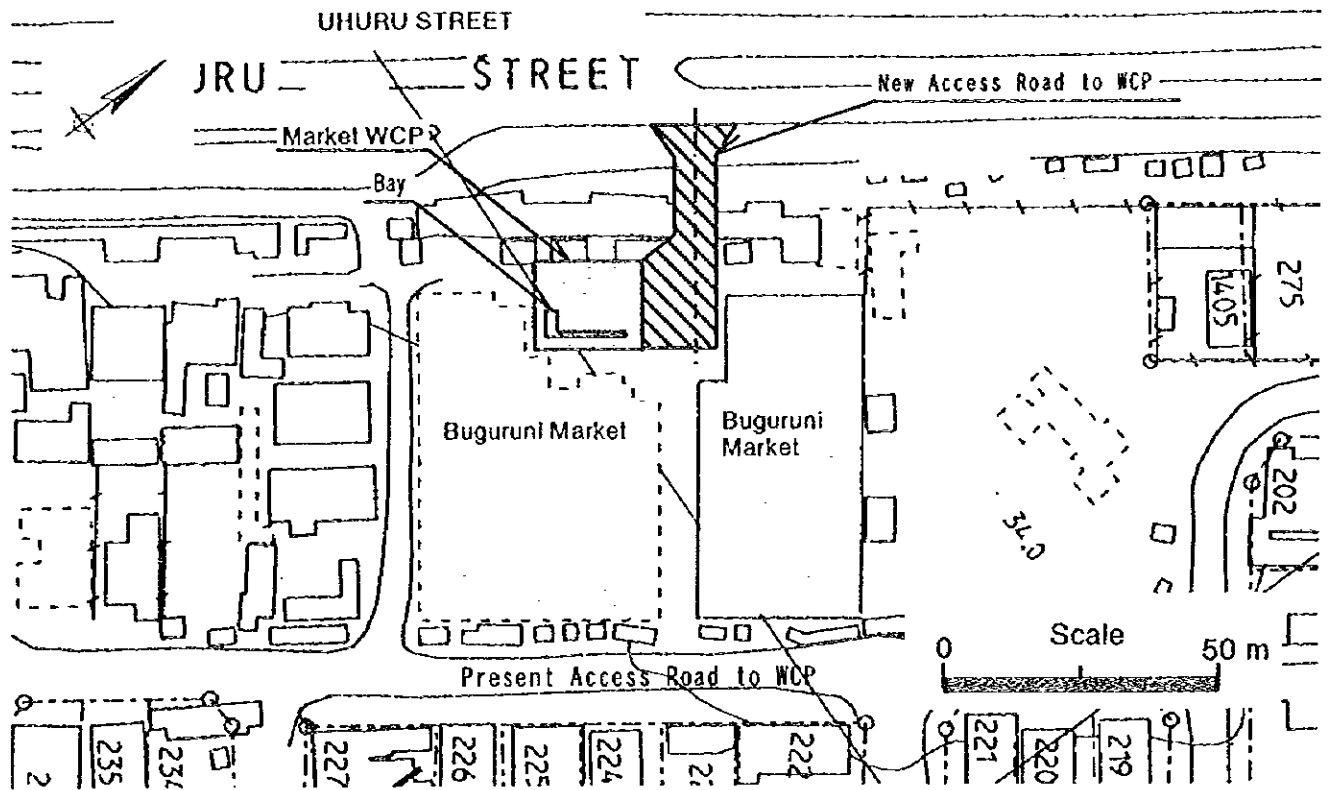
Improvement Plan for Buguruni Market and Access Road
